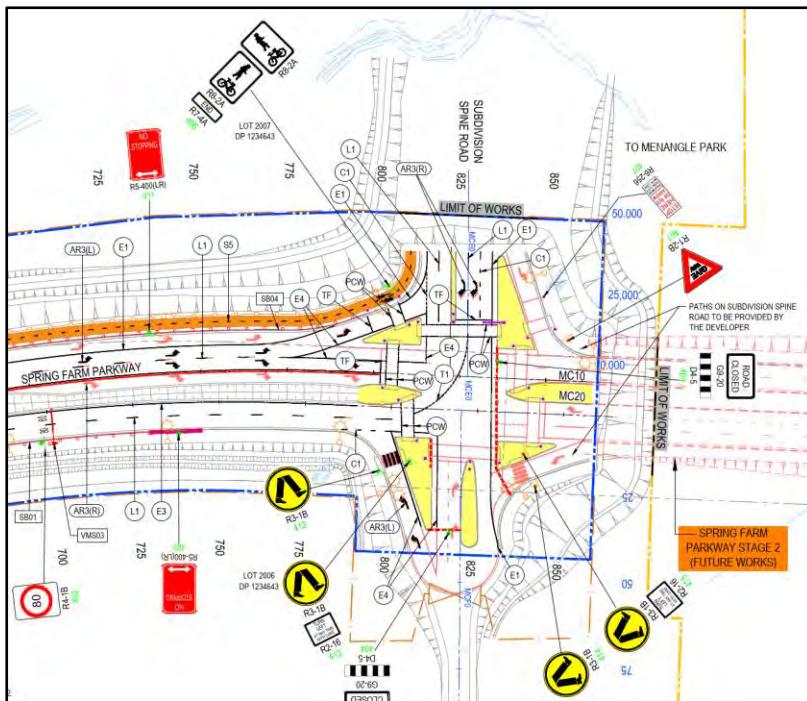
Spring Farm Parkway and Access Road (Spine Road) 2026 Arrangement
